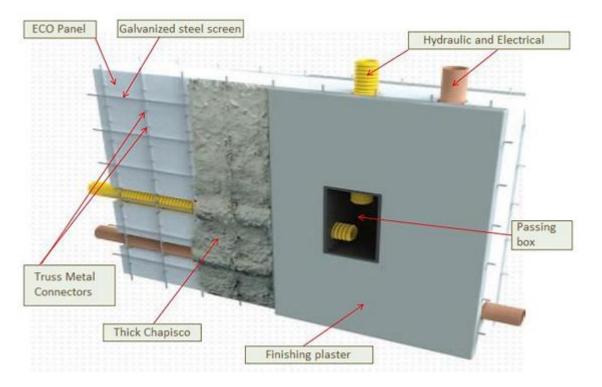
Electrical and hydraulic installations Source: MONOFORTE, 2016.
